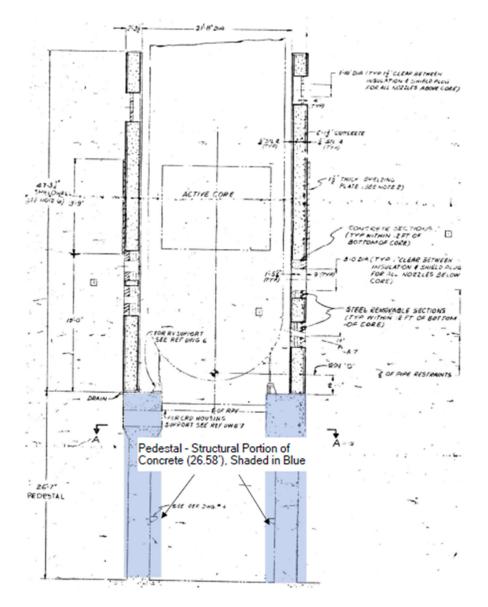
Section Through Hatch Unit 1 Reactor Shield Wall and Pedestal
